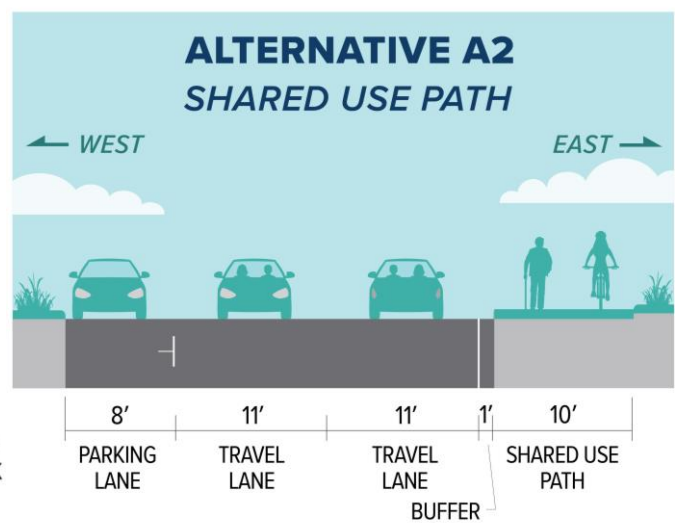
FRANKLIN AVENUE ALTERNATIVE A1 AND A2 - 6<sup>TH</sup> STREET CROSS SECTION
